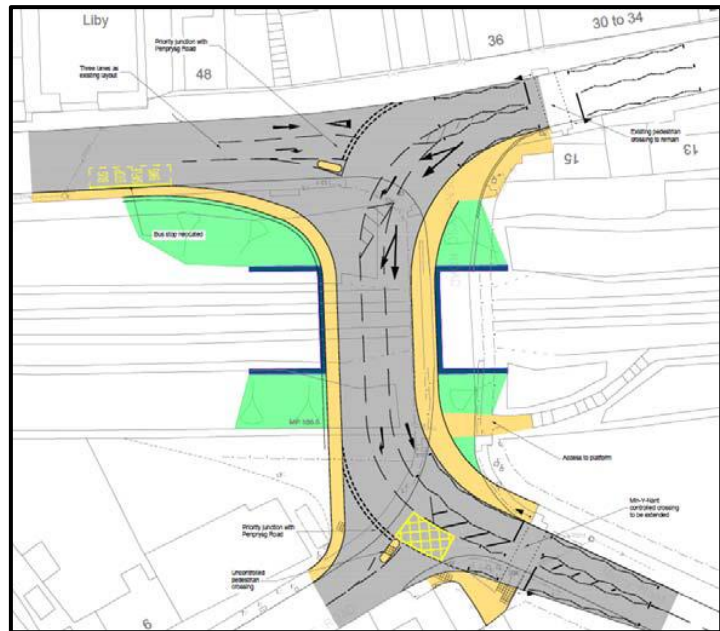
Penprysg Road Bridge Feasibility Report Option 5B
